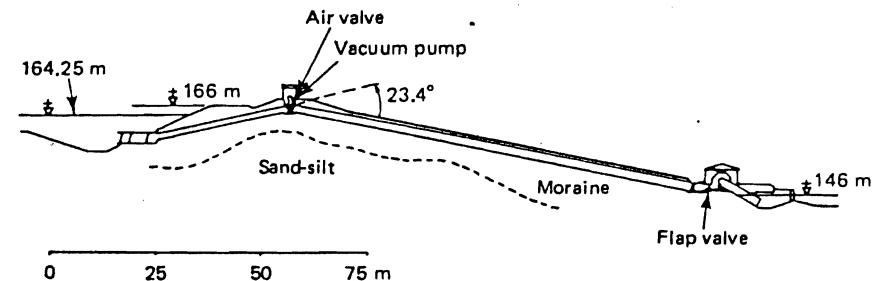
Diagram of siphon penstock type of hydropower installation (Kaarni Power Station, Finland). SOURCE: Imatran Volma OY.
